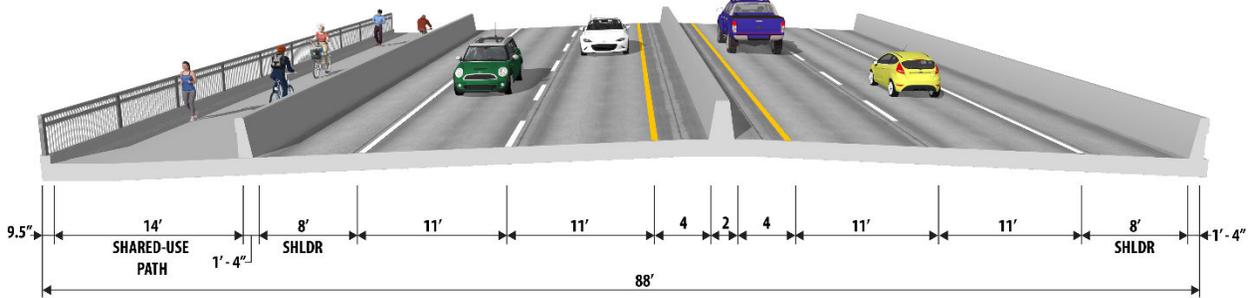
Proposed High-Level Fixed-Bridge Alternative Typical Section.
